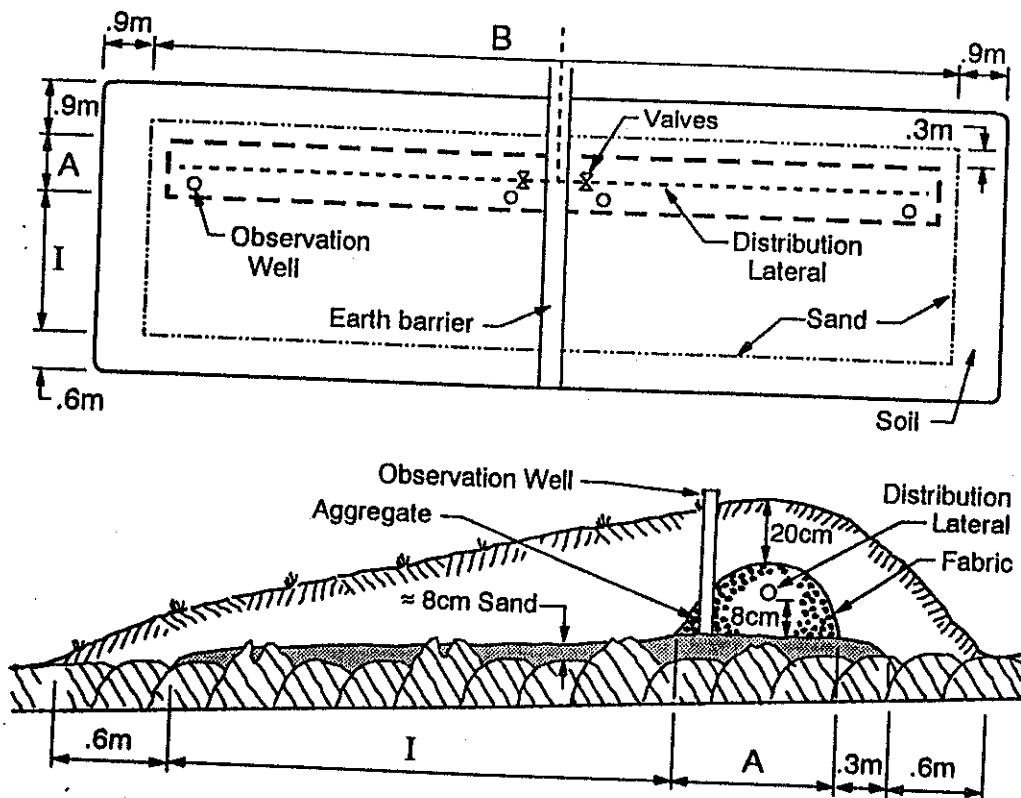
Cross Section and Plan View of Modified Mound Unit
